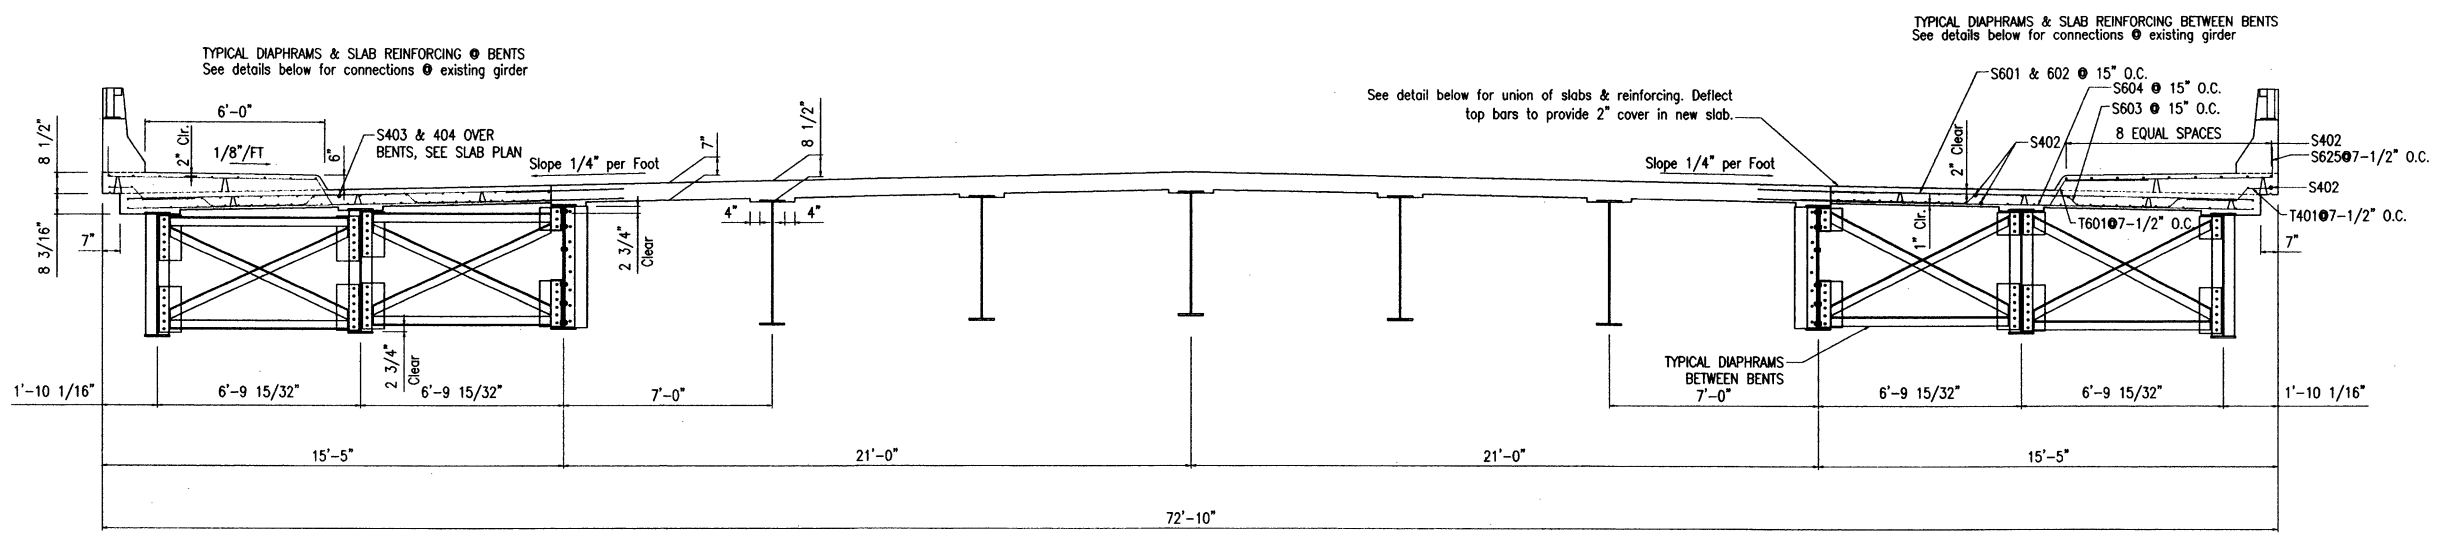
'-9 3/8" CONTINUOUS COMPOSITE PLATE GIRDER UNIT
